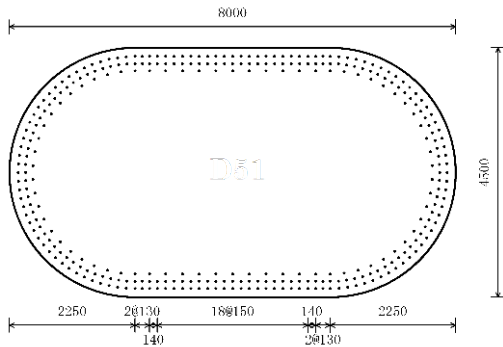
Arrangement of deformed steel bar in piers P9 and P10
